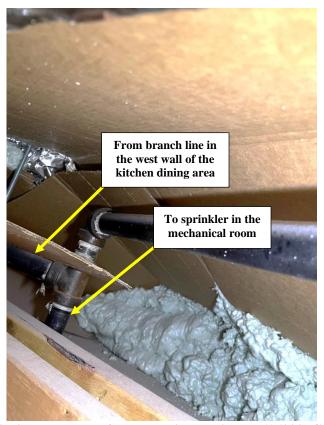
Sprinkler branch for the subject sprinkler (16020_CBS_2-042).
